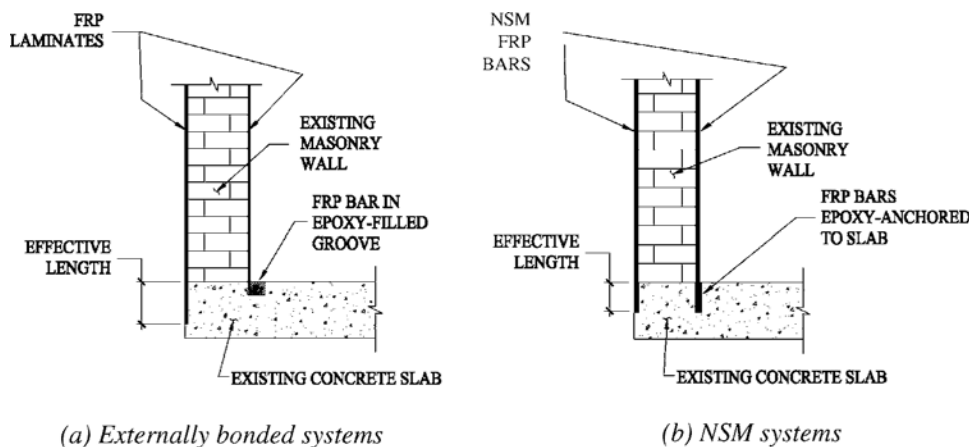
Recommended anchorage details for externally bonded systems.
